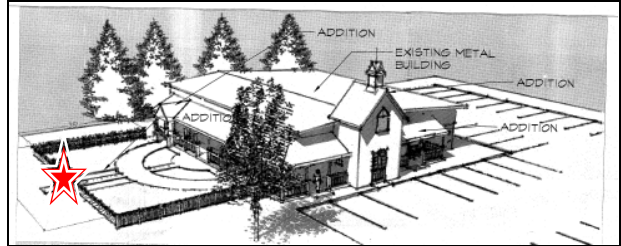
Approved building elevation showing 2007 additions. 2016 approved gazebo location marked with a star.
